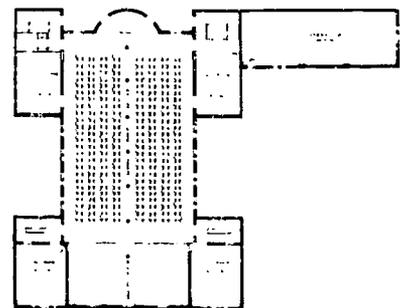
P.S. 4, Rivington Street, Manhattan, 1854, second floor plan
